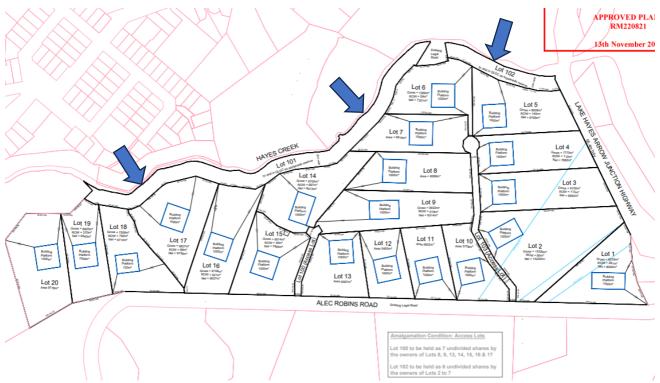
Extract of the approved subdivision scheme plan showing Lots 101 and Lot 102 to vest (identified with blue arrows)
